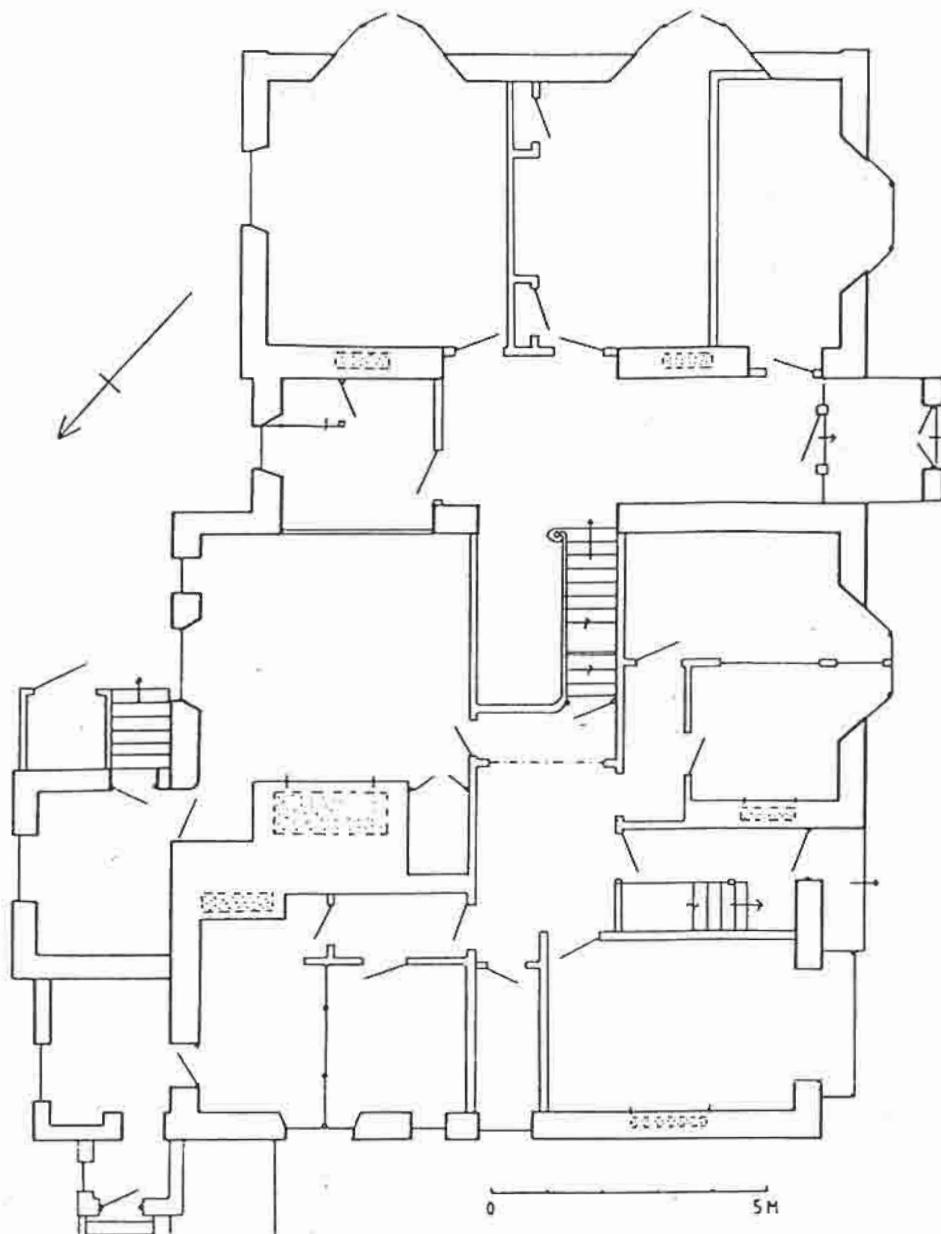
Silverton Mill; ground floor plan of Bridge House.
